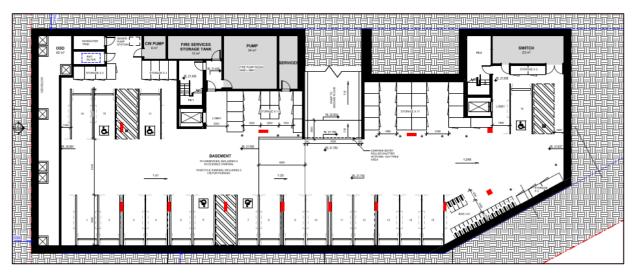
Basement floor plan. Source: WMK Architecture, dated 18 October 2024
